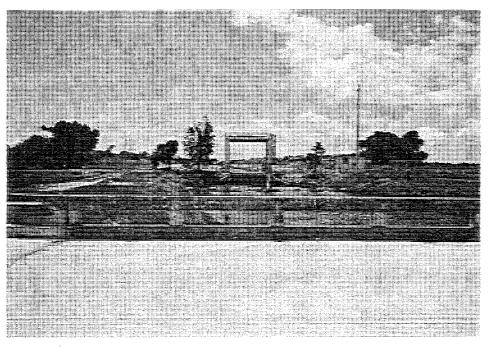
LOOKING DOWNSTREAM AT S-177, ON C-111.
